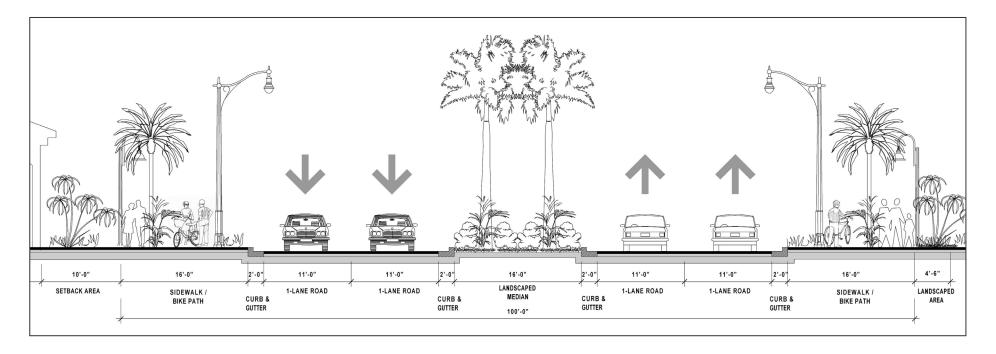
Typical Cross-section on the JFK Causeway in North Bay Village Alternative 2
